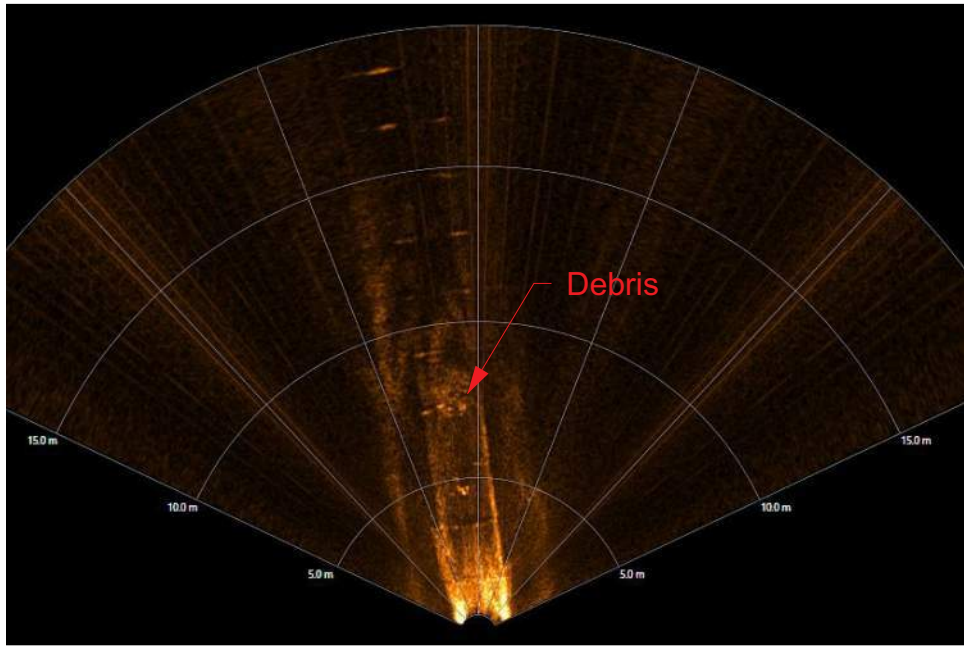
Sonar image at 704 feet downstream of Access Point 1. Debris on invert 13 and 43 feet ahead.
